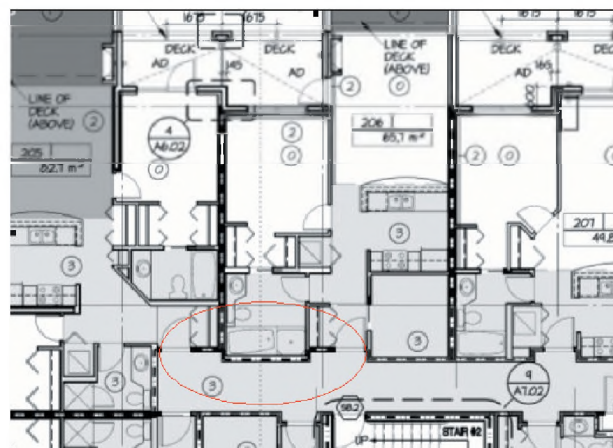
; Layout of ASTC Test in Suite 206 showing Corridor Bathroom, Suite 206 Entry to right and Suite 205 Entry to Left.
